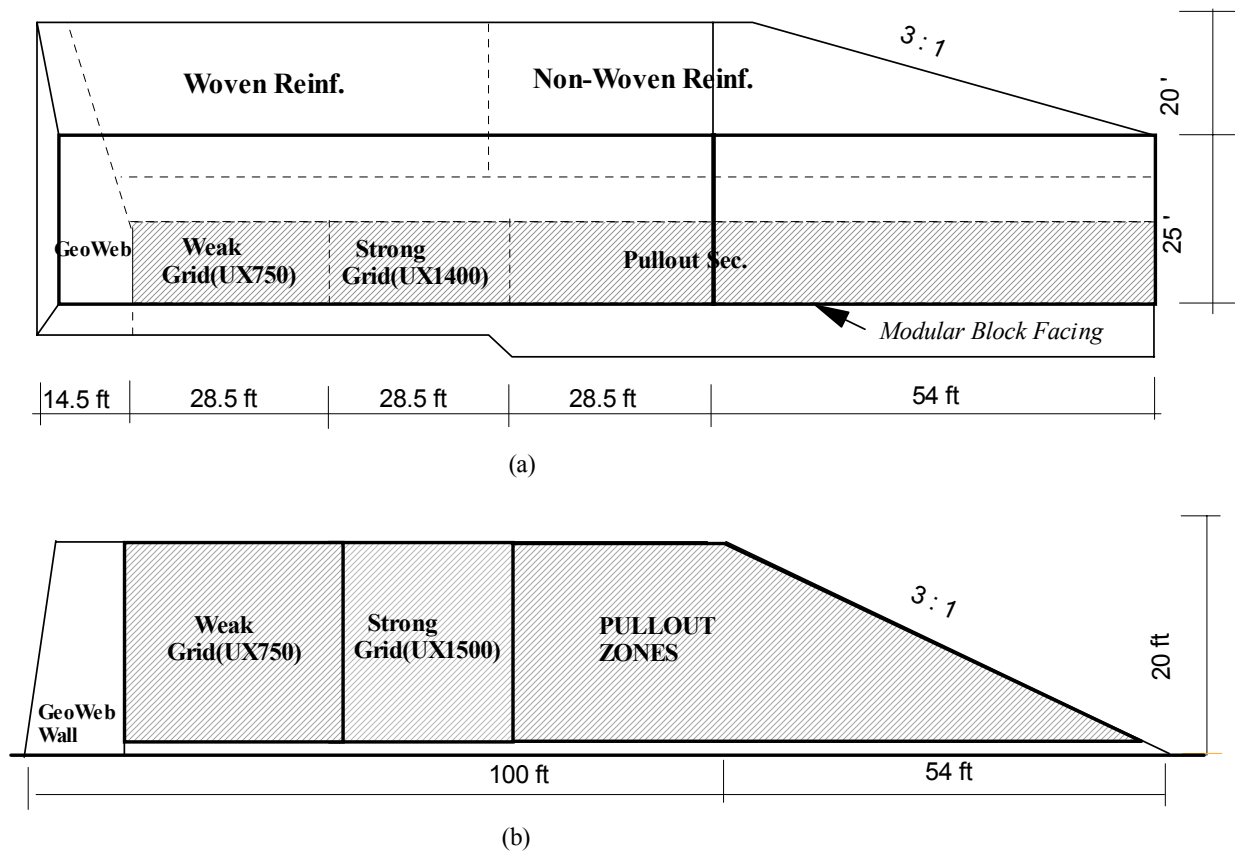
Schematics of the LTRC test wall (a) Plan of the LTRC test wall; (b) Elevation of the LTRC test wall (Farrag, 2003).
